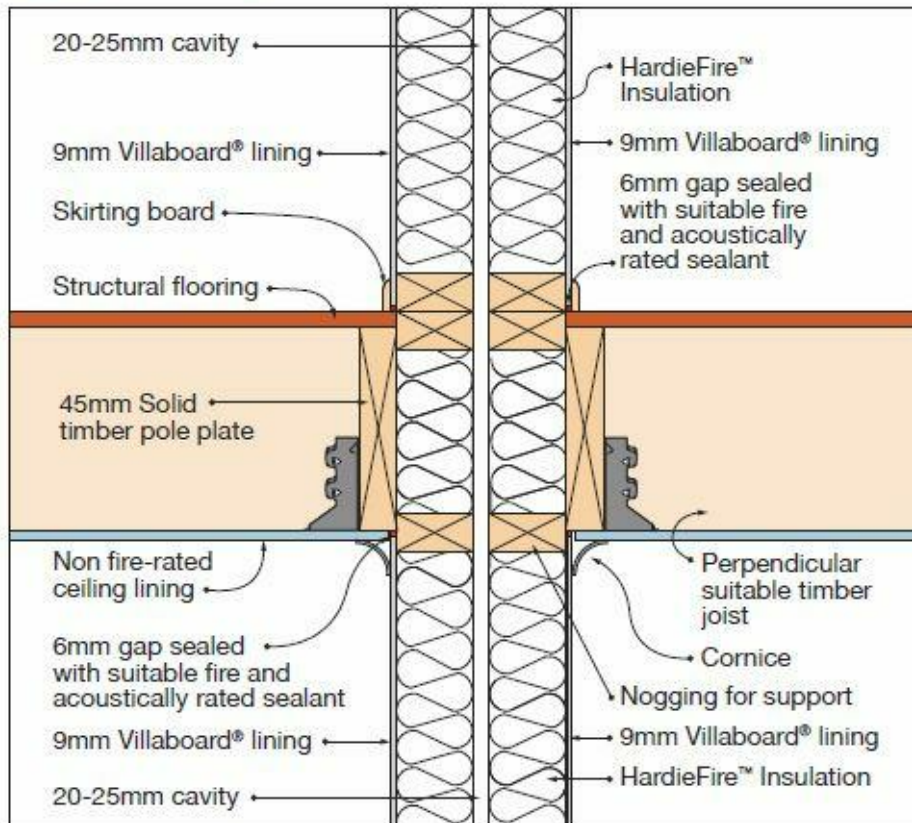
HARDIESMART™ INTERTENCY WALL SYSTEM WITH UPPER STOREY FLOOR OPTION 2
